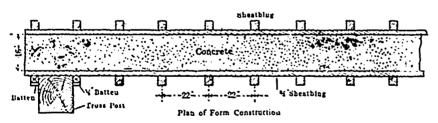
SHOWING CONCRETE-FORM CONSTRUCTION
